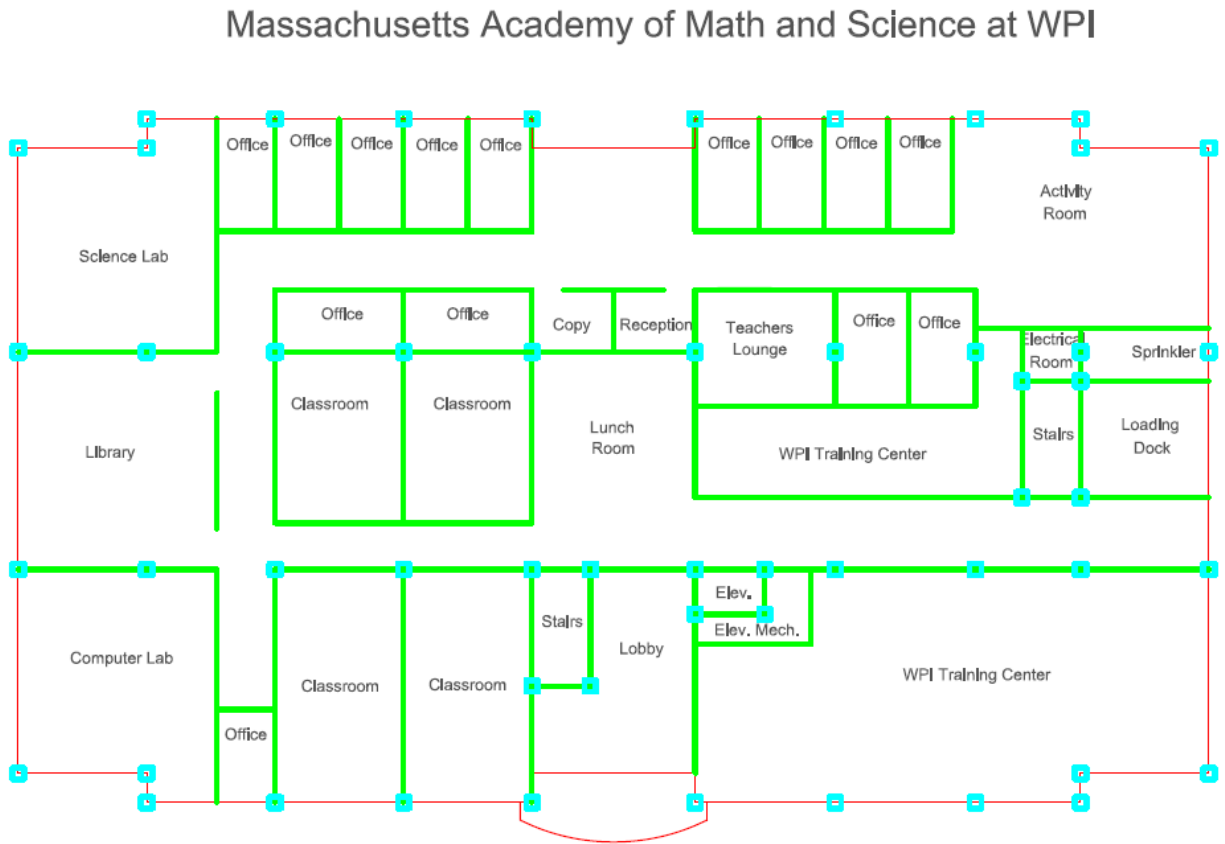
Floor layout for Massachusetts Academy of Math and Science
